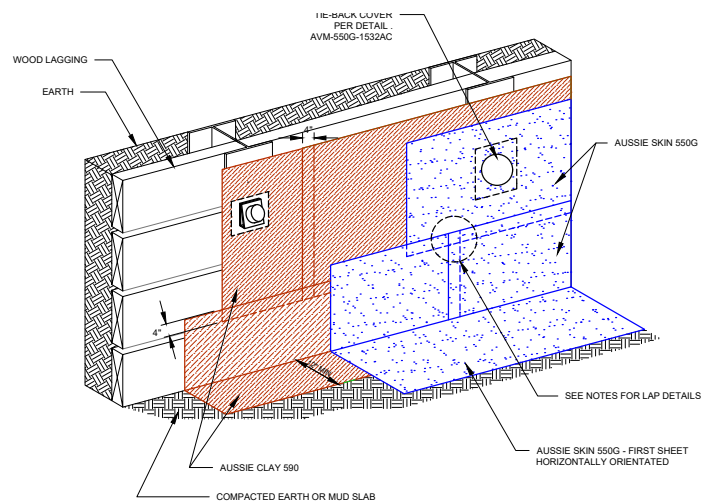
WALL TO SLAB TRANSITION OF DUAL LAYER SYSTEM
